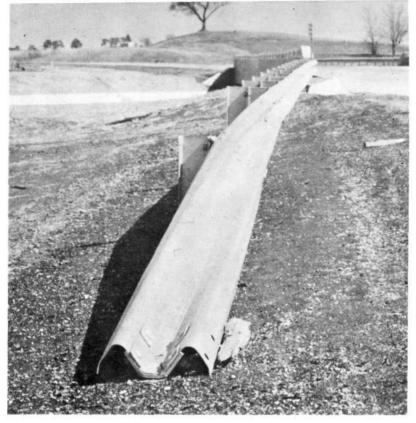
Here is another guardrail turned and anchored at ground level on the approach to a bridge structure. Some designers prefer to have even less of the end of the rail exposed. Note the undesirable projection of the bridge curb in the background.
